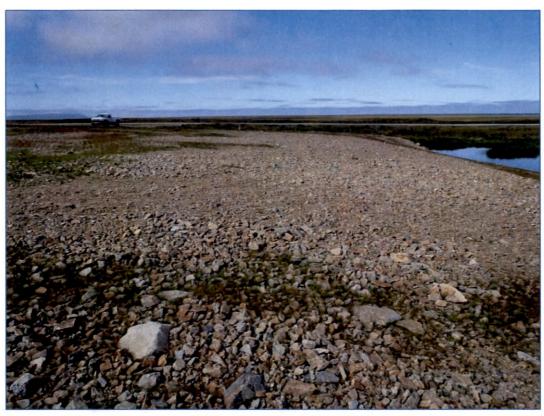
Site 9 Landfill – North side of landfill, facing northwest.
